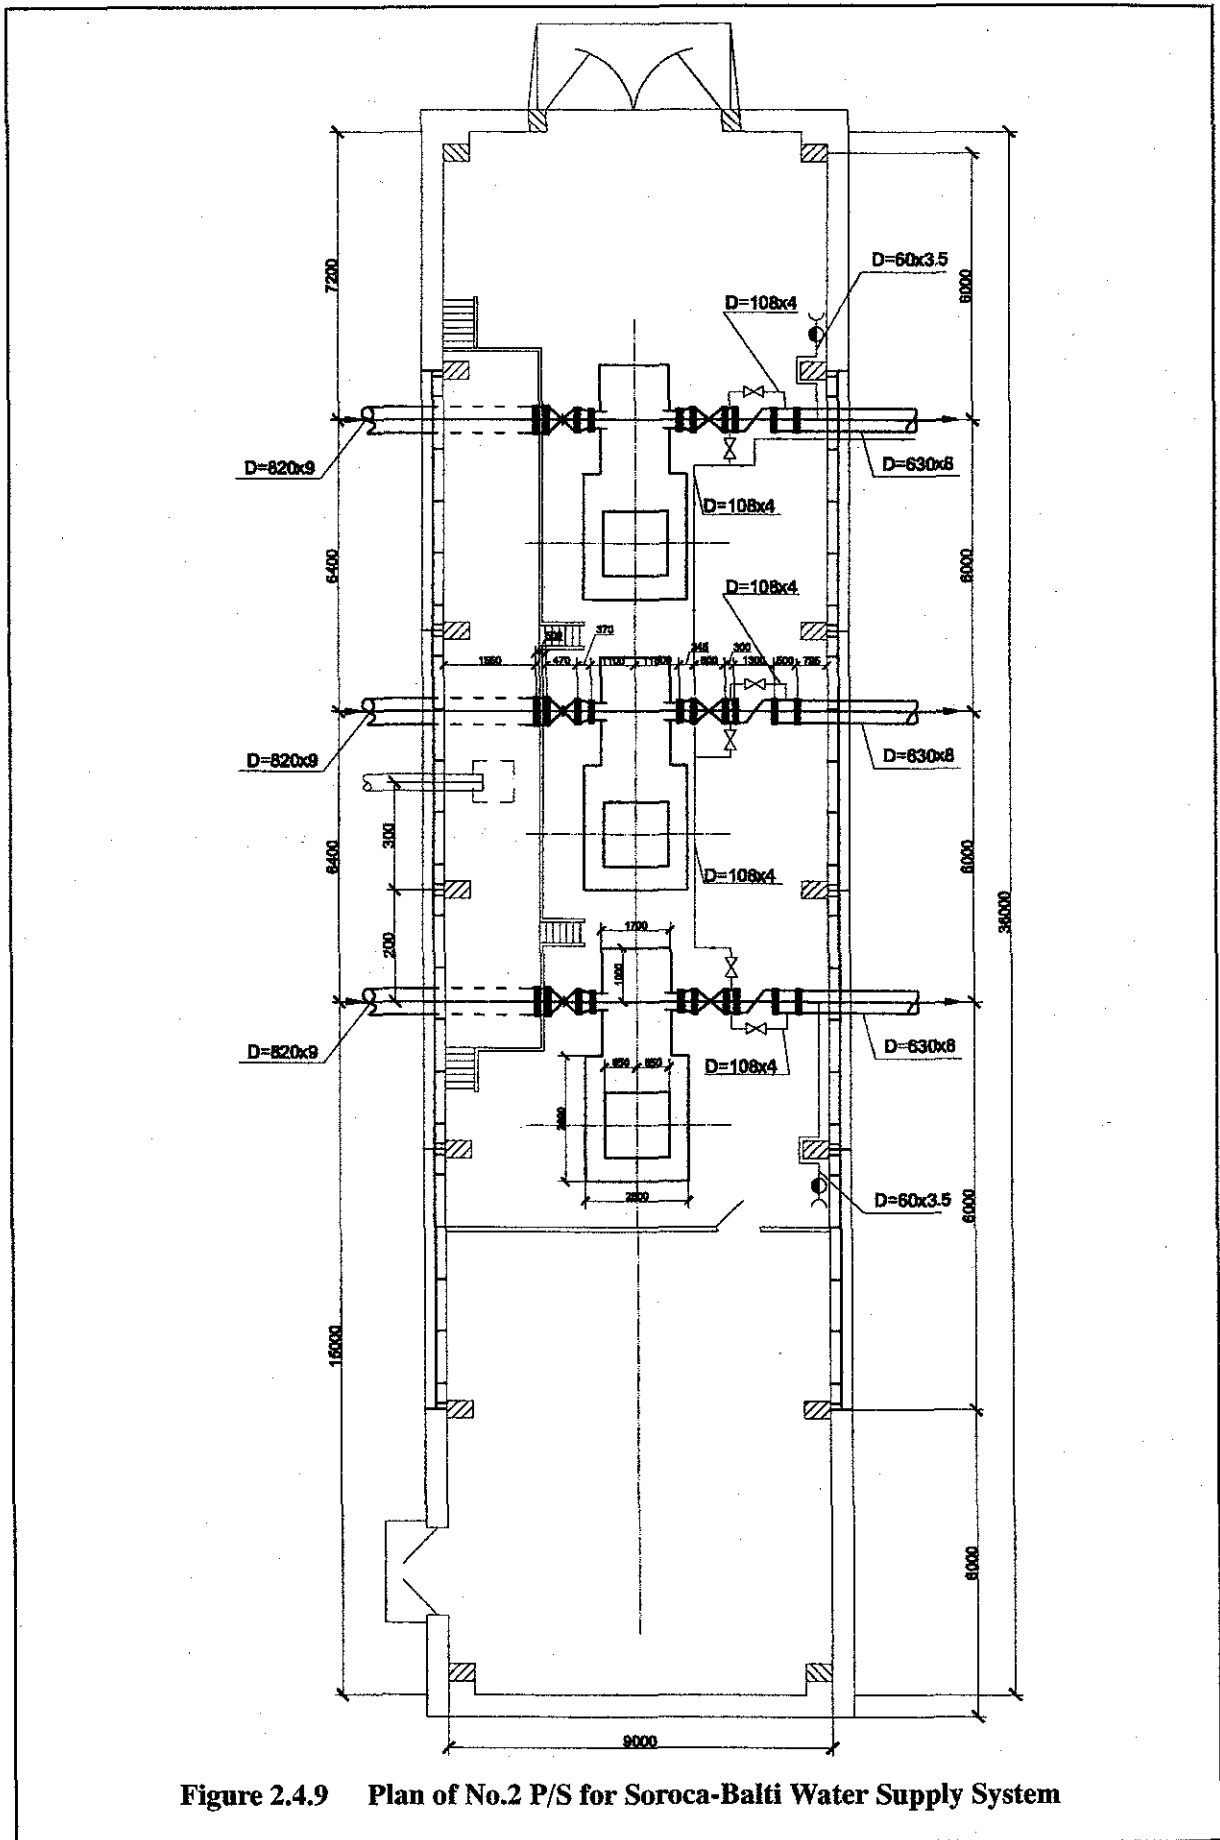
Plan of No.2 P/S for Soroca-Balti Water Supply System
